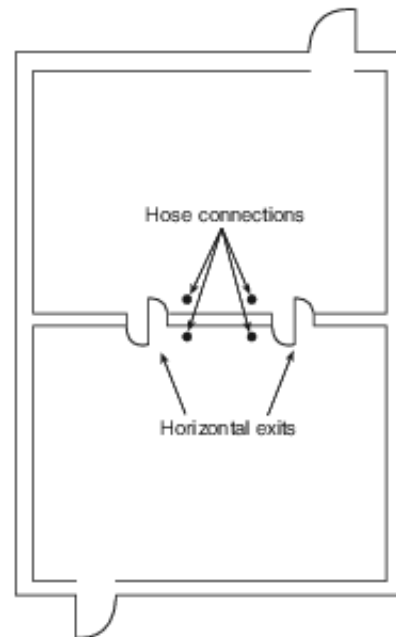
(b) Location of hose connections at horizontal exits.
